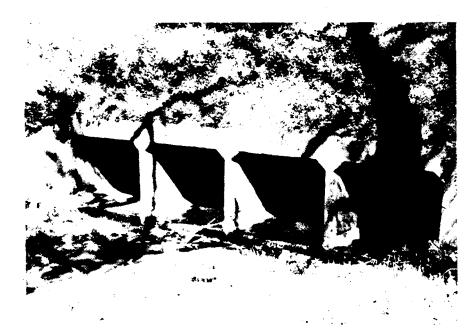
Cast-in-Place Concrete Multicell Box Culvert
